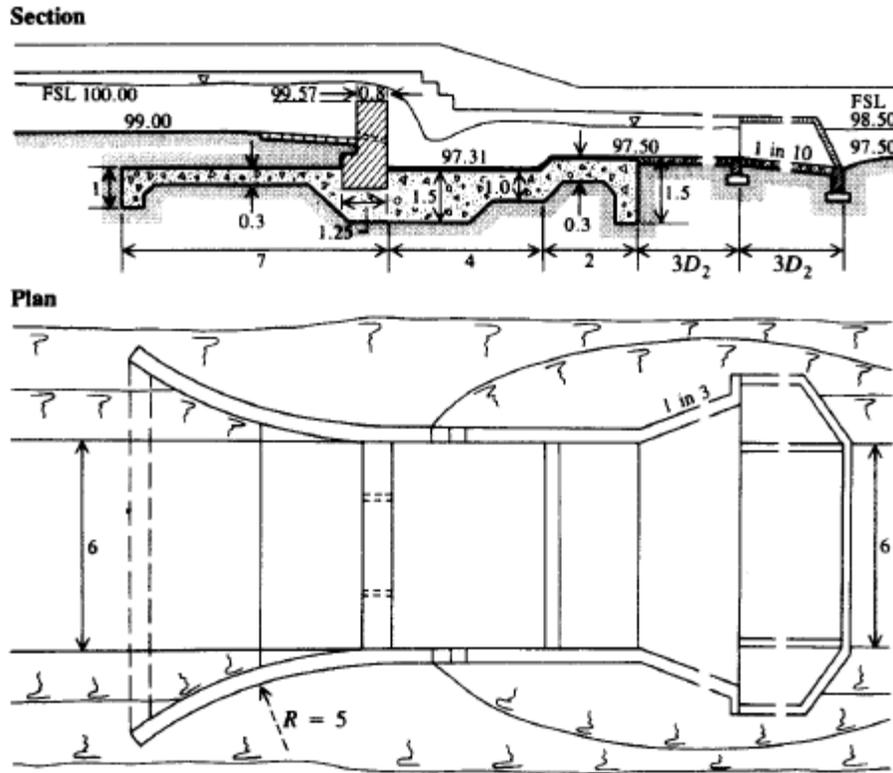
Sarda fall layout (Worked example 10.7); dimensions in metres
